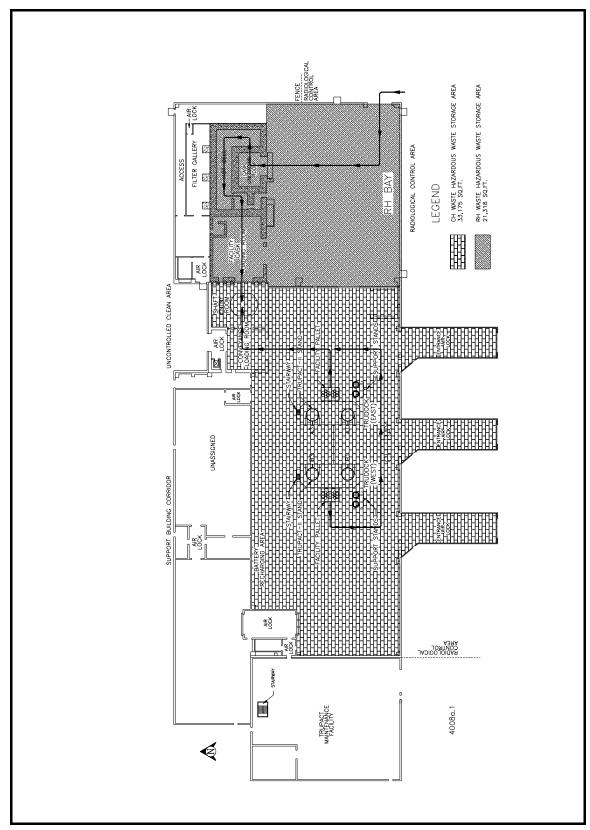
, Waste Transport Routes in the Waste Handling Building
